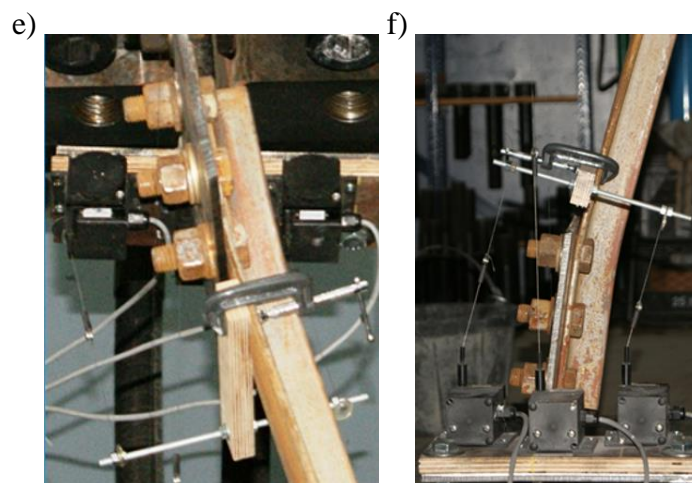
Specimen No. 5 - Observed behaviour during the test: a) in-plane bending; b) buckling of brace; c) opening of the legs (front); d) opening of the legs (back); e) bending at top connection; f) bending at bottom connection (continued)
